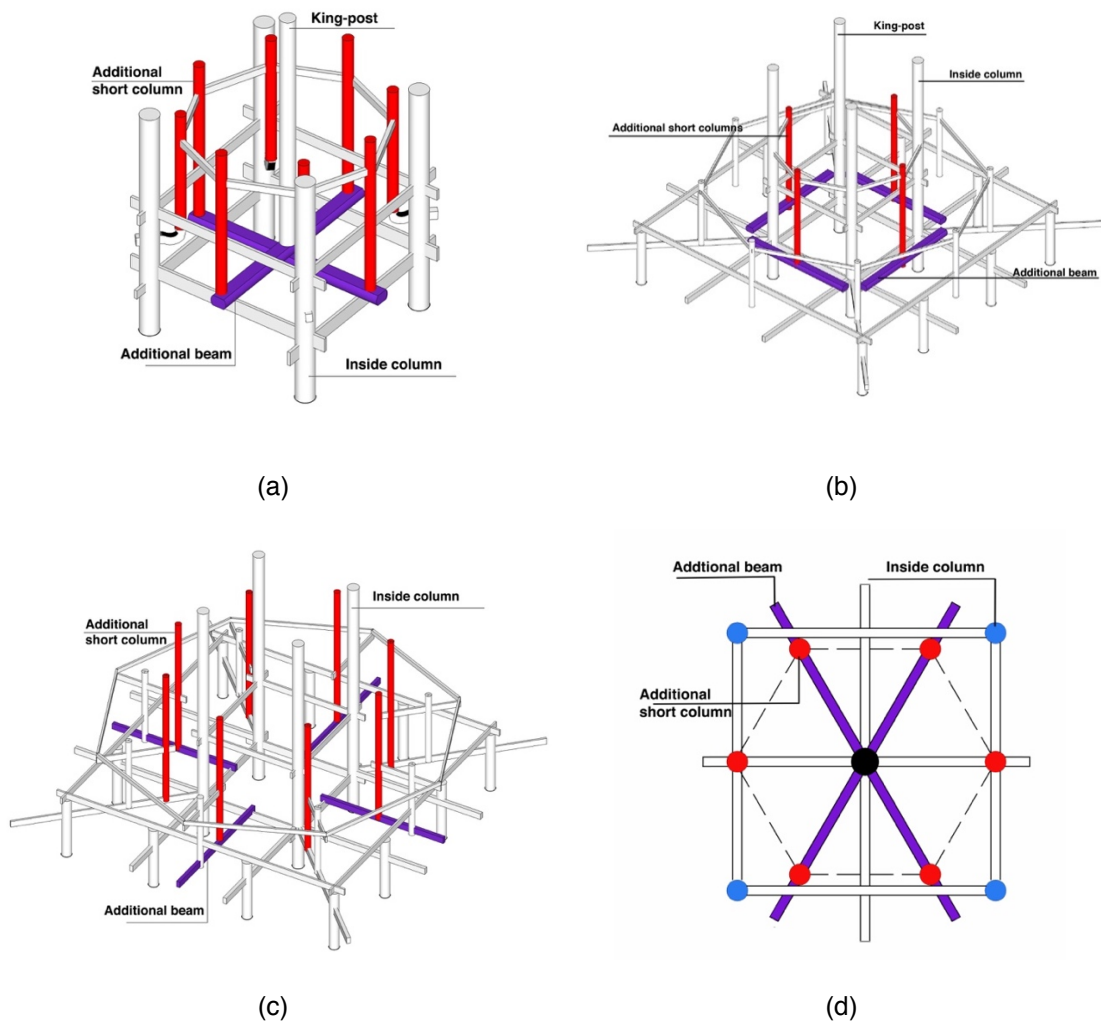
Four methods of “additional short columns” (Draw by author)
